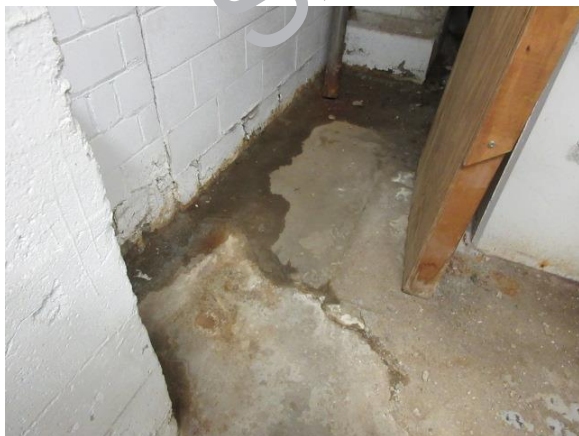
MOISTURE INTRUSION INTO BASEMENT
